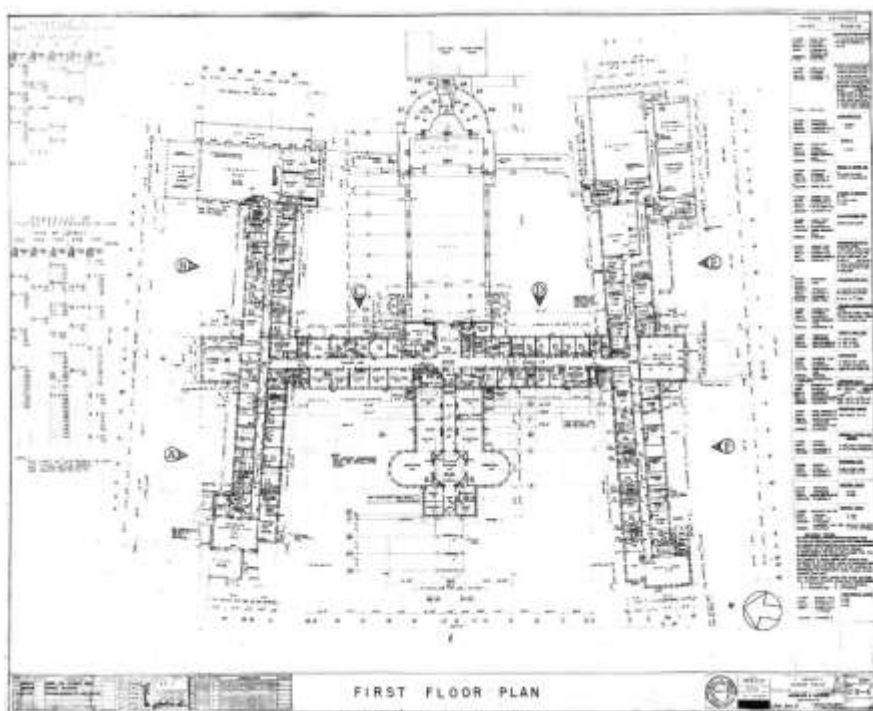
First floor plan for Sisters of St. Joseph Motherhouse building, Marani, Morris & Allan (Heritage Planning).
